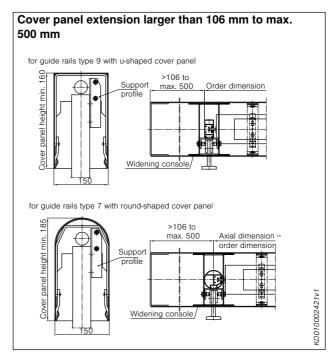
Cover panel extension larger than 106 mm to max. 500 mm
